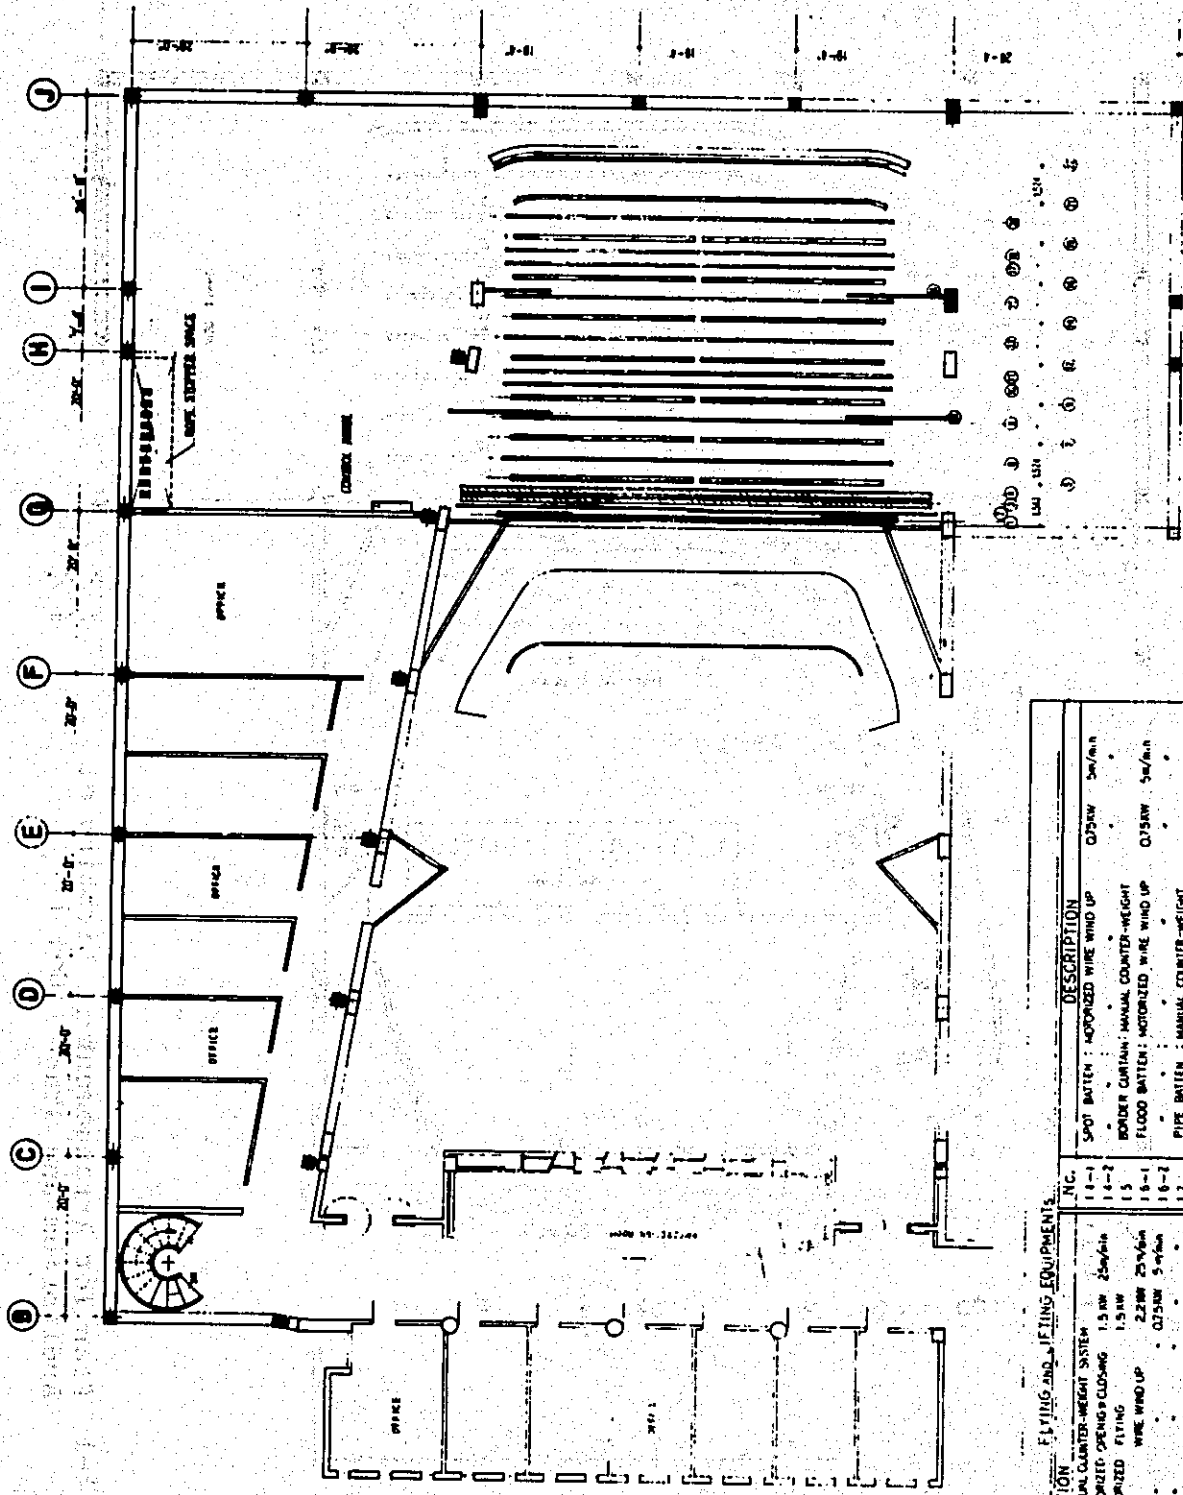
Plan for Arrangement of Lighting and Facilities (No. 2)
